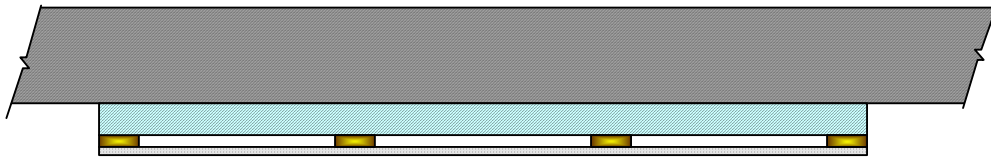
Wall 4 (Extruded polystyrene (2") w. gypsum wall board)
